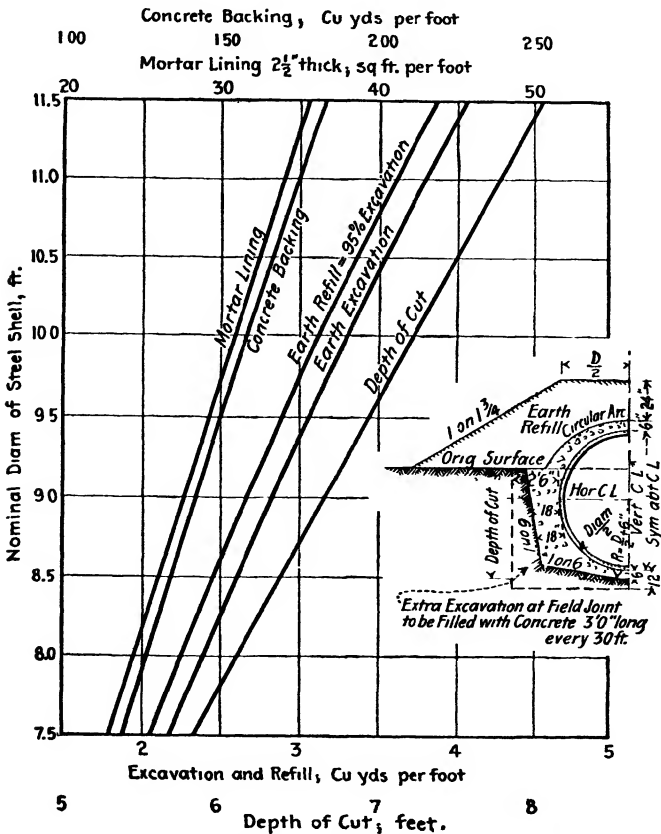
Concrete-covered steel pipe, in compact earth. Earthwork, concrete and mortar lining quantities
